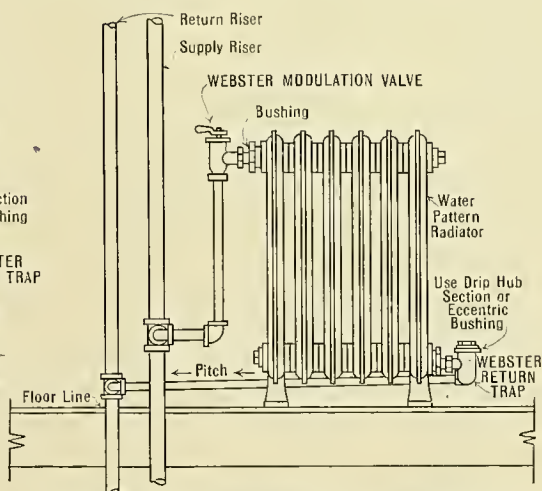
Arrangement of connections to a radiator with all branch run-outs exposed in the room
